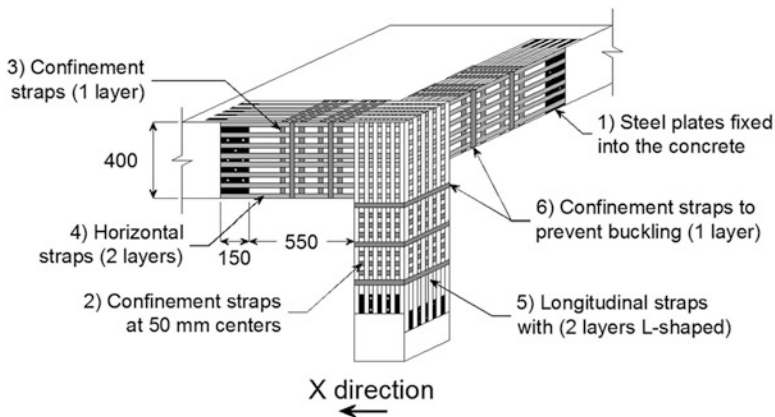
PTMS strengthening at 2nd floor beam-column joints
